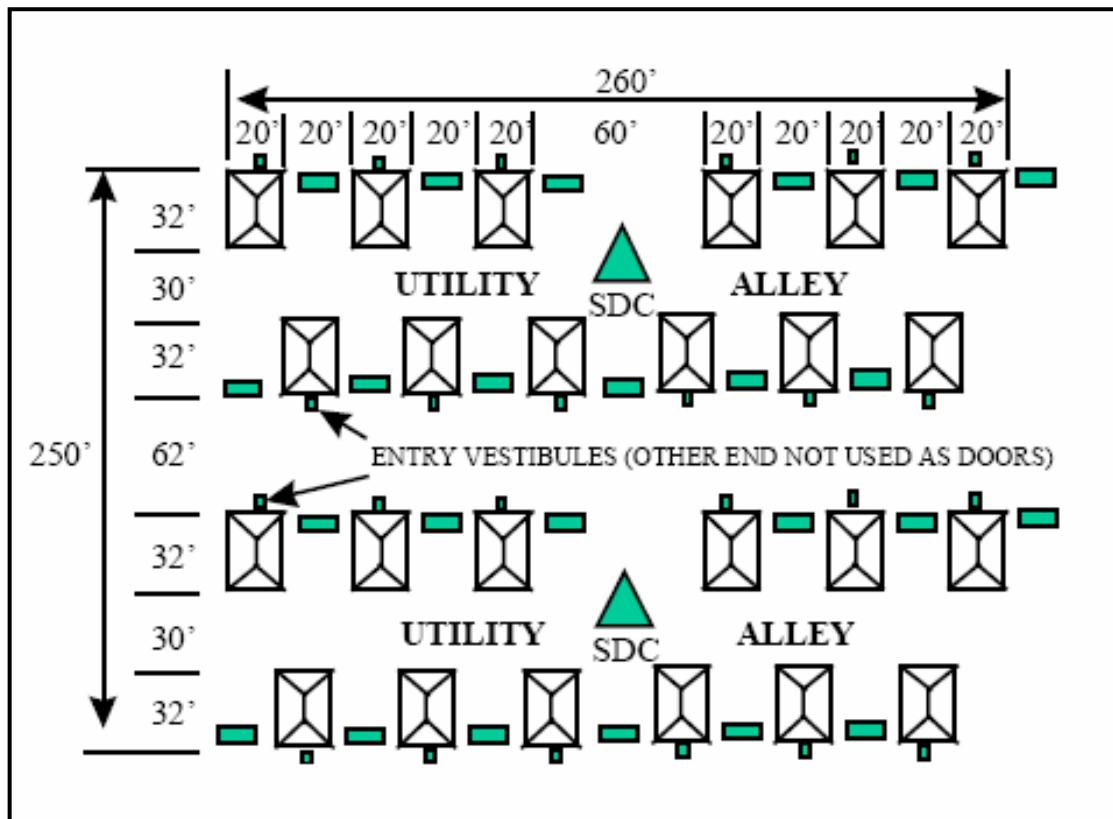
Standard Layout of a Tent City Composed of AKSSSs
